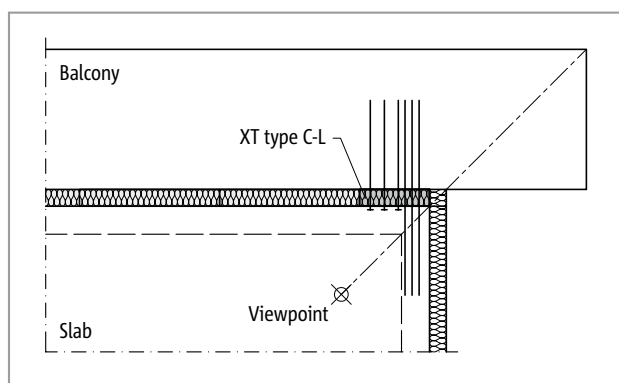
Schöck Isokorb® XT type C: Balcony projecting over corner of building (application XT type C-L)
